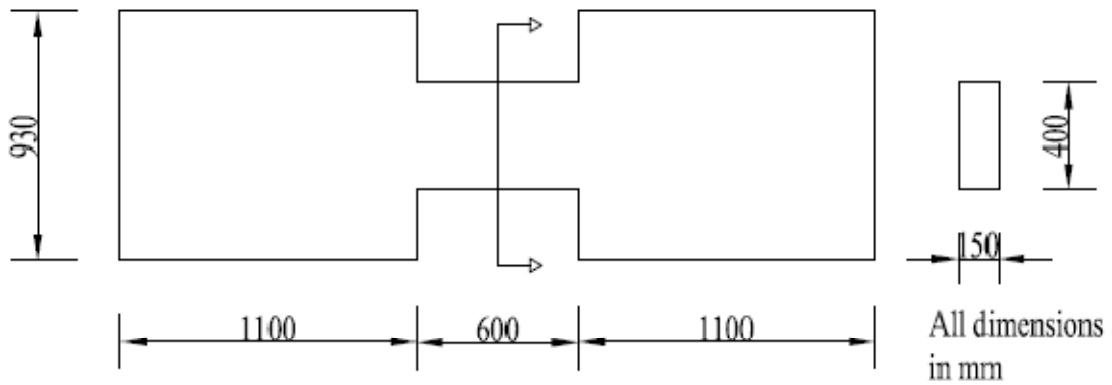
Dimensions of the Coupling Beam Specimen P02 (Adapted from Galano and Vignoli 2000)
